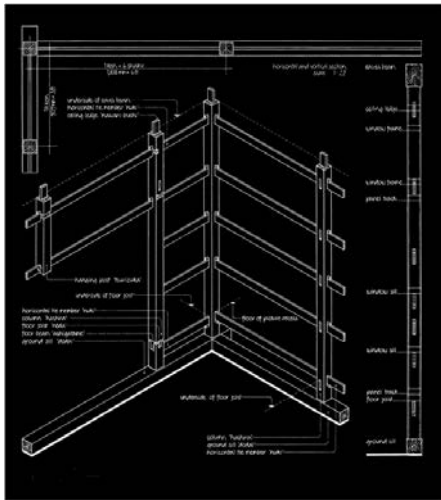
Wall framework in a Japanese traditional house (Engel, Heino. Measure and Construction of the Japanese House (p. 2). Tuttle Publishing. Kindle Edition. 2020)
